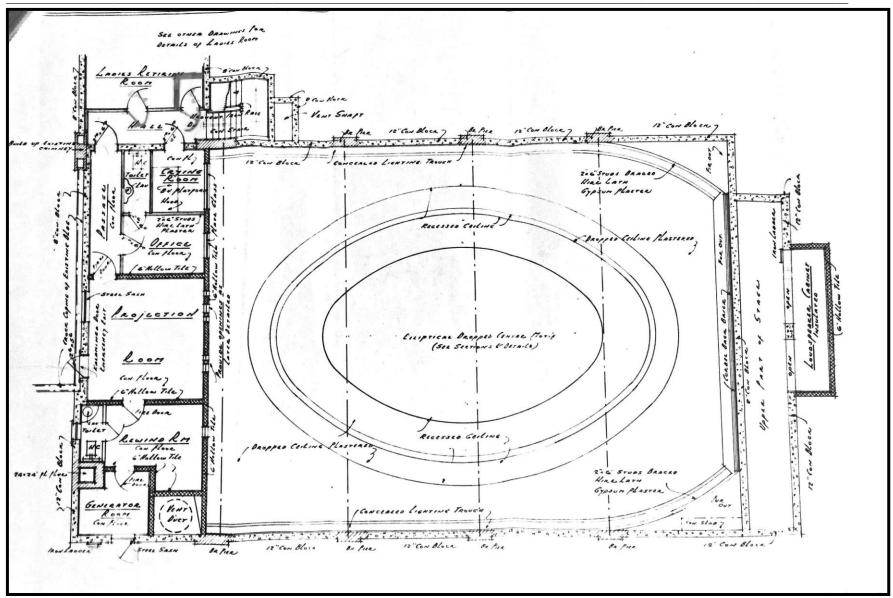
Second Floor Plan and Ceiling Detail of 1014 King Street West, Hamilton – Westdale Theatre (Photo provided by City of Hamilton; Riddell 1935g)
